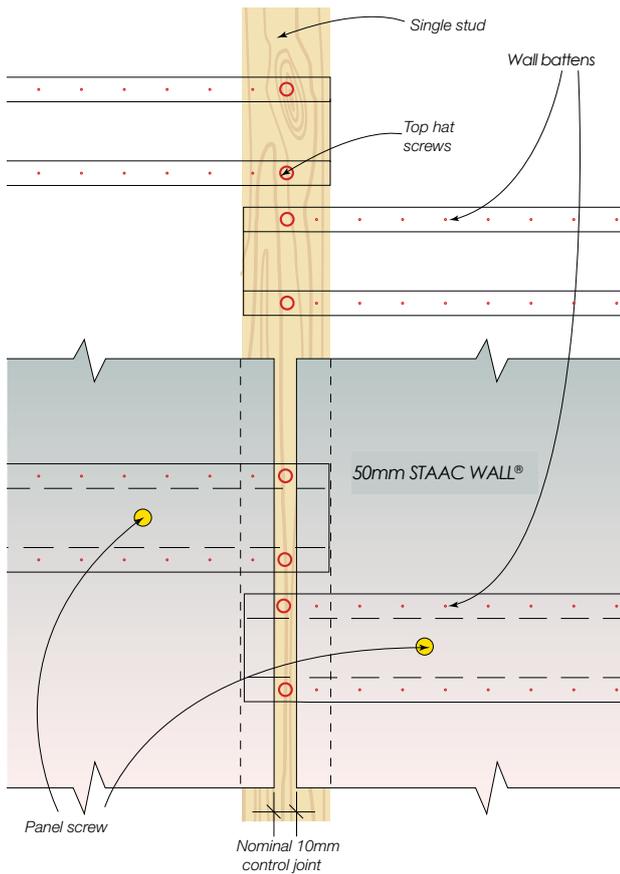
Typical vertical control joint (Achieves FRL 90/90/90 when installed as part of the wall system.)
